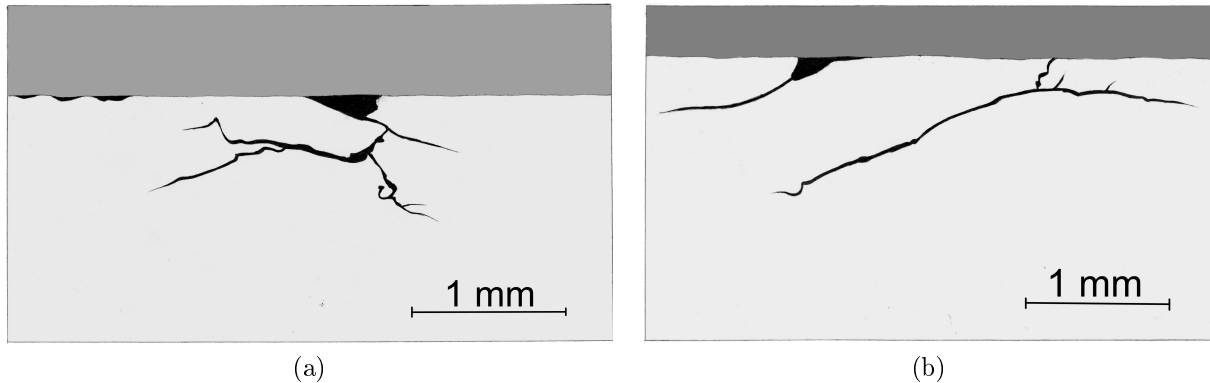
Initial stages of development of checking cracks and spalls. (a) Transverse section of the rail, (b) longitudinal section of the rail. It is possible to note how the crack grows vertically into the rail head in a first instance and then levels out. .
